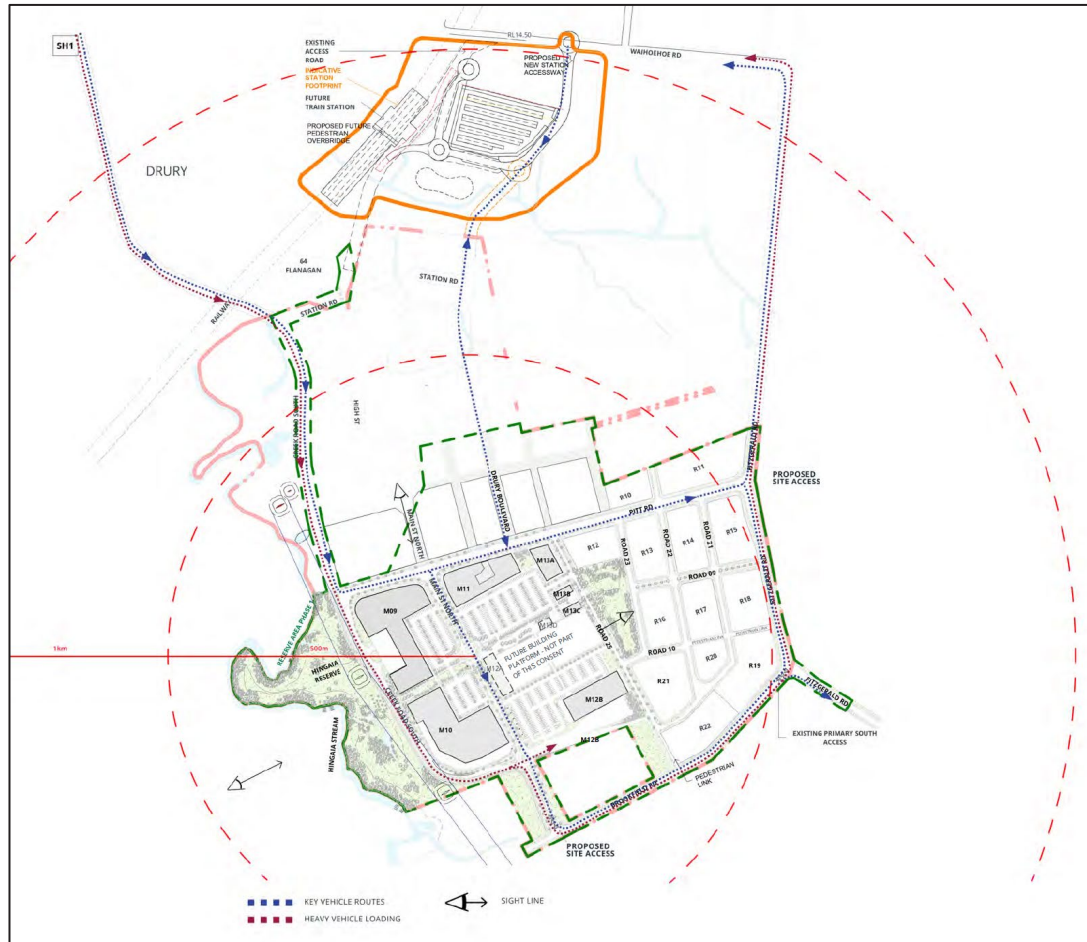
Approved layout plan of additional retail activities within Stage 1 Fast Track Consent. Additional retail activities are identified as building M12B and extension to building M10.
